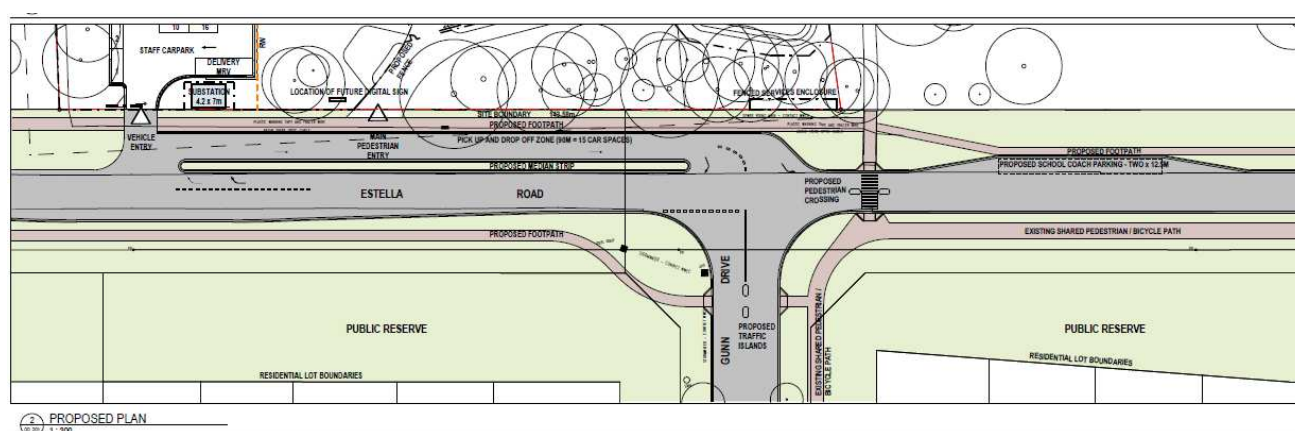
Proposed Estella Road pick up / set down arrangement and channelised right hand turn
